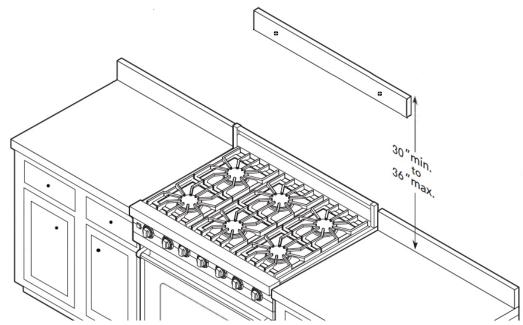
MOUNTING BOARD (OPTIONAL)
